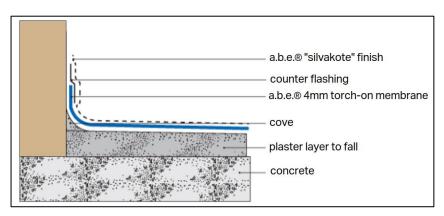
Typical detail showing waterproofing layering on top of concrete canopy and cable duct cappings
